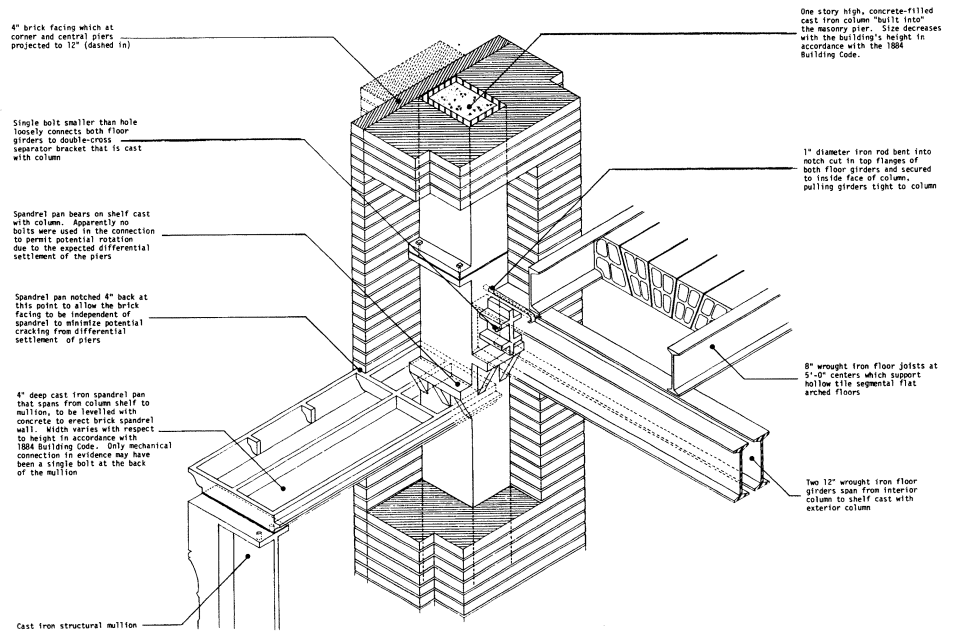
Jenney, Home Insurance Building. Reconstruction of the structural detailing of the exterior piers. (Drawing by Deborah Cohen and Maxwell Merriman).
